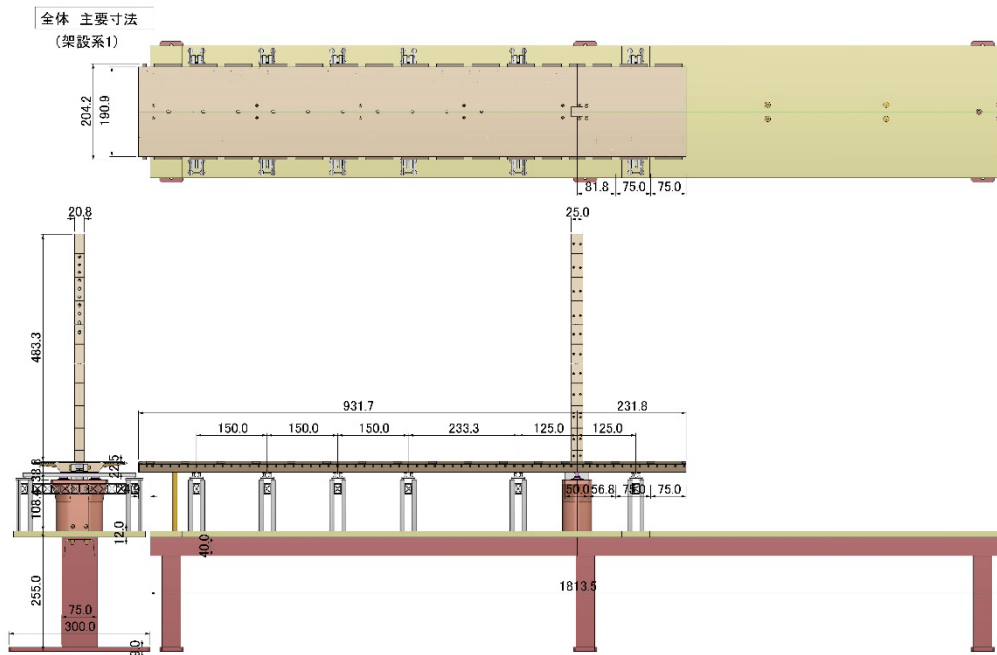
The elastic model (for under construction stage before the lowest cable being installed and just after the first segment of the main girder was installed), unit in mm)
